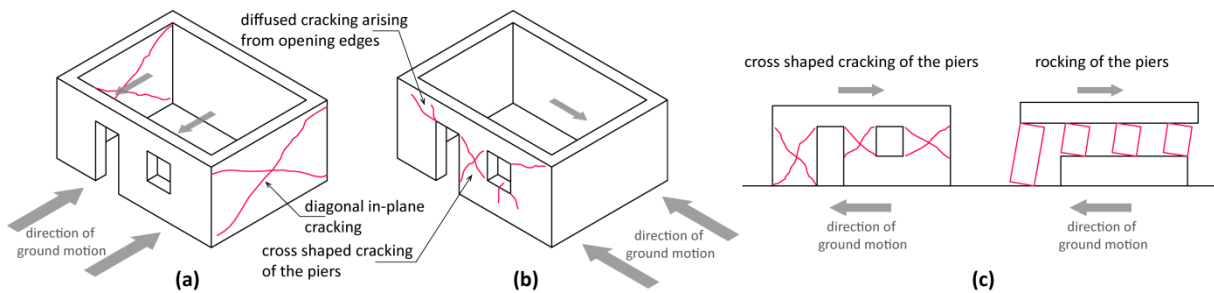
(a) In-plane shear failure in the direction of the wall length; (b) shear cracking around the openings; and (c) shear cracking versus rocking of the piers (Bothara and Brzev 2012)
